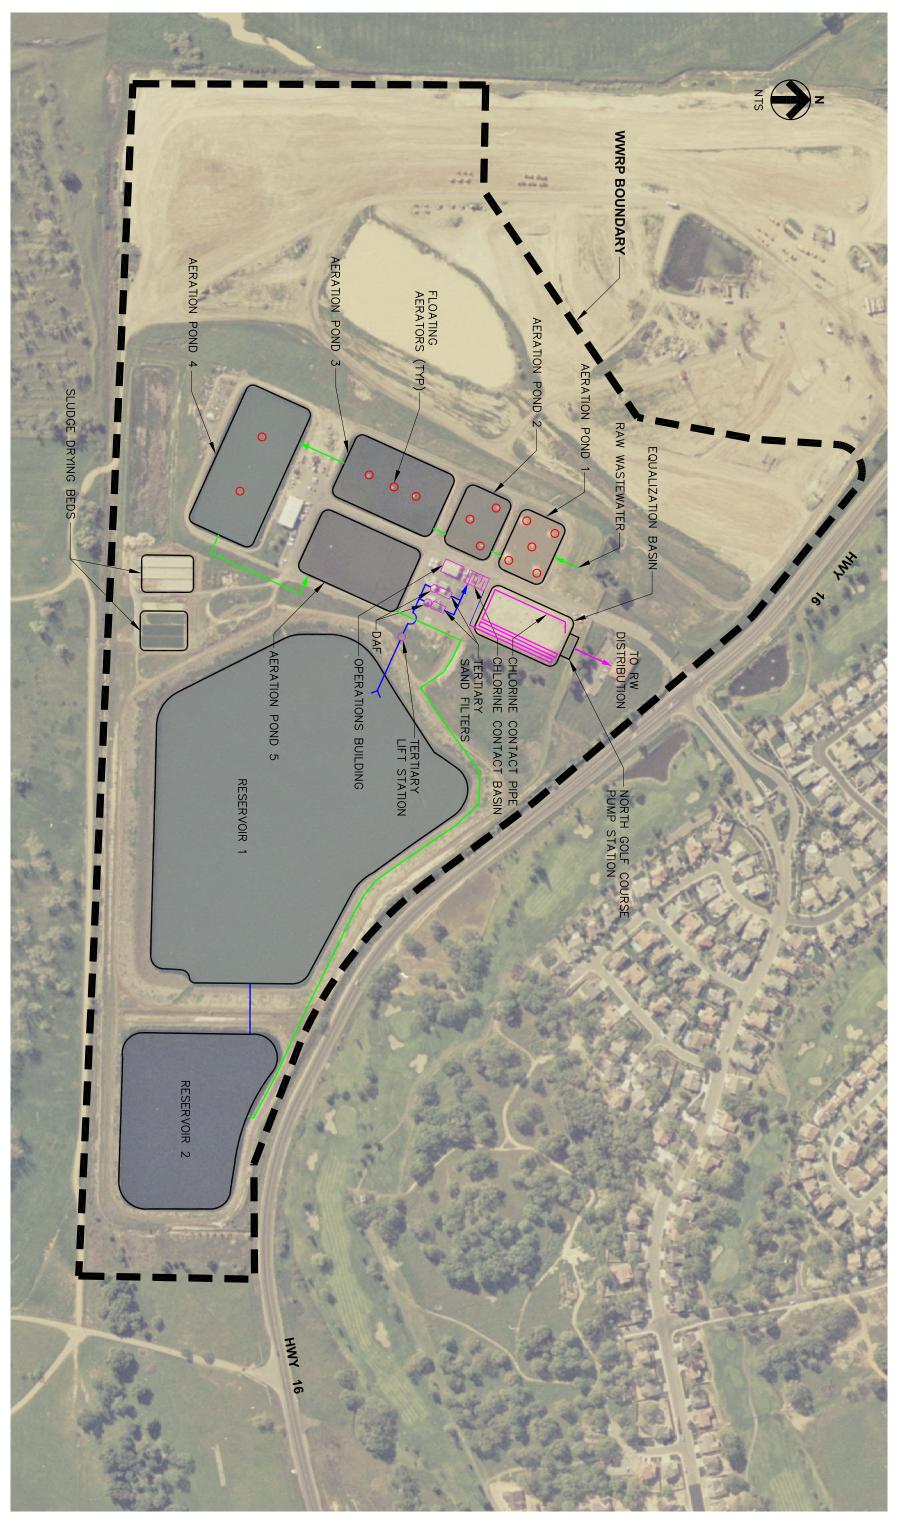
Wastewater Facilities Expansion and Financing Plan WWRP FACILITY LAYOUT
